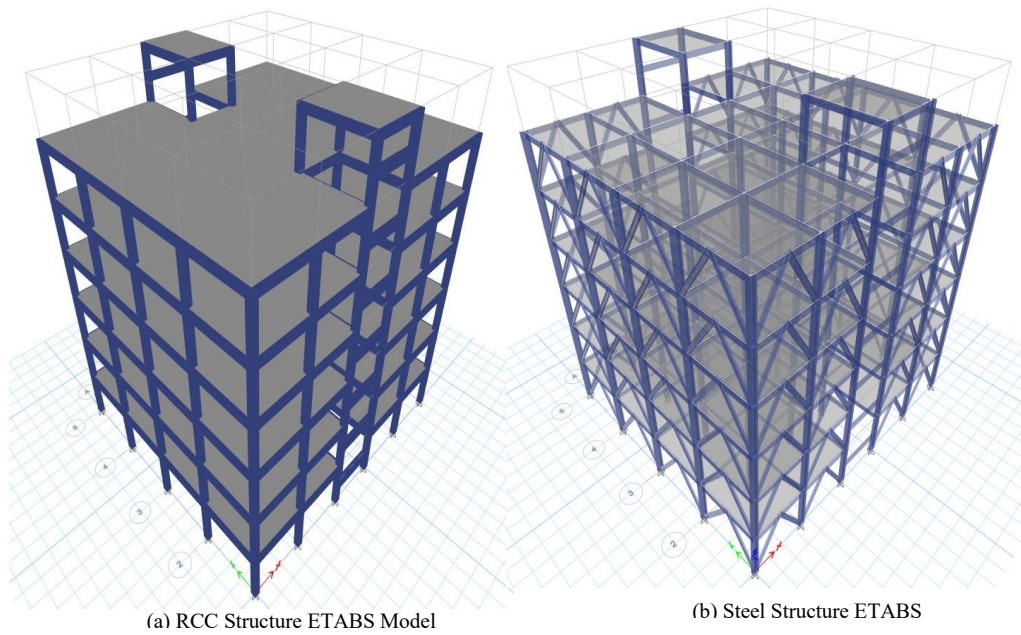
RCC and Steel Structure Buildings 3D ETABS Models
